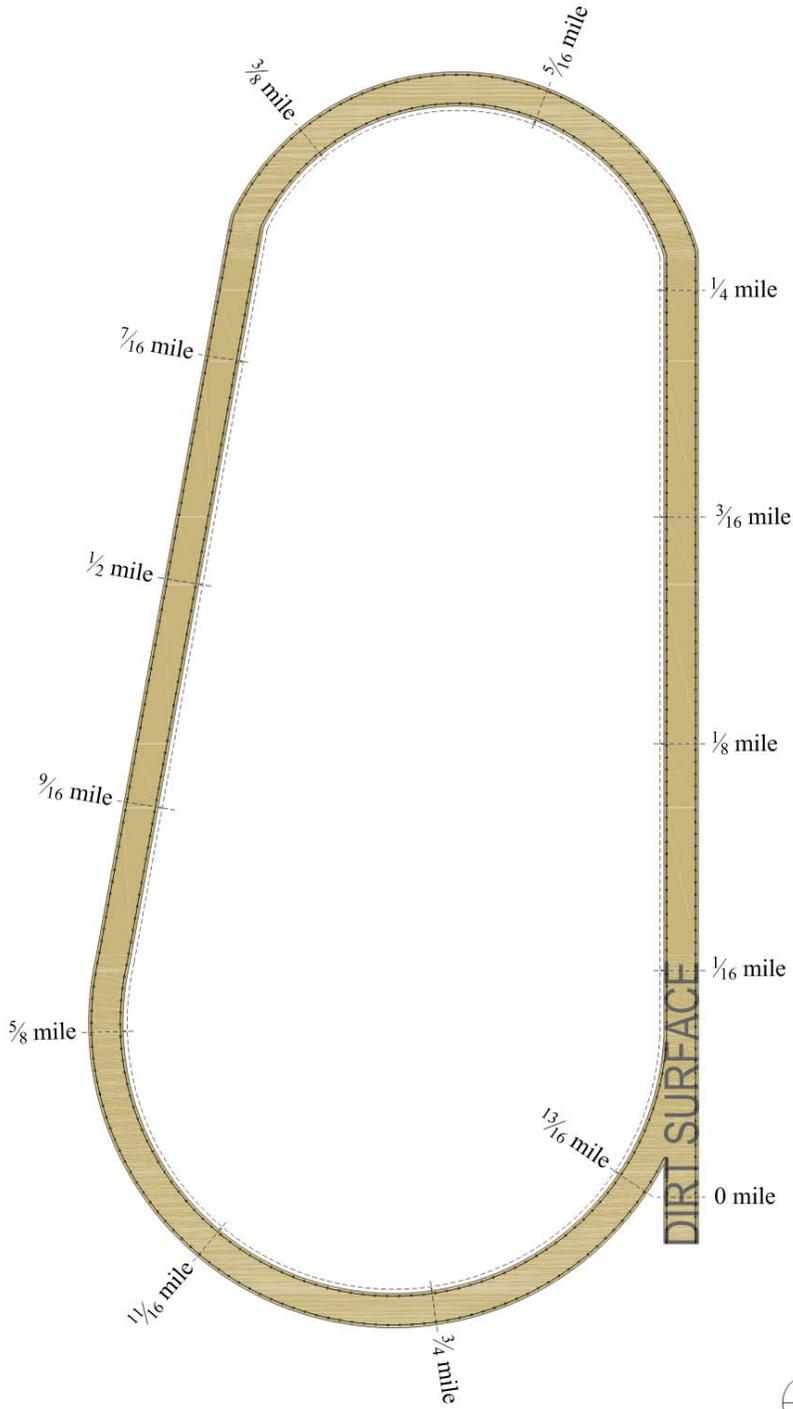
Plan of conventional dirt surface at Bridlewood Farm.
